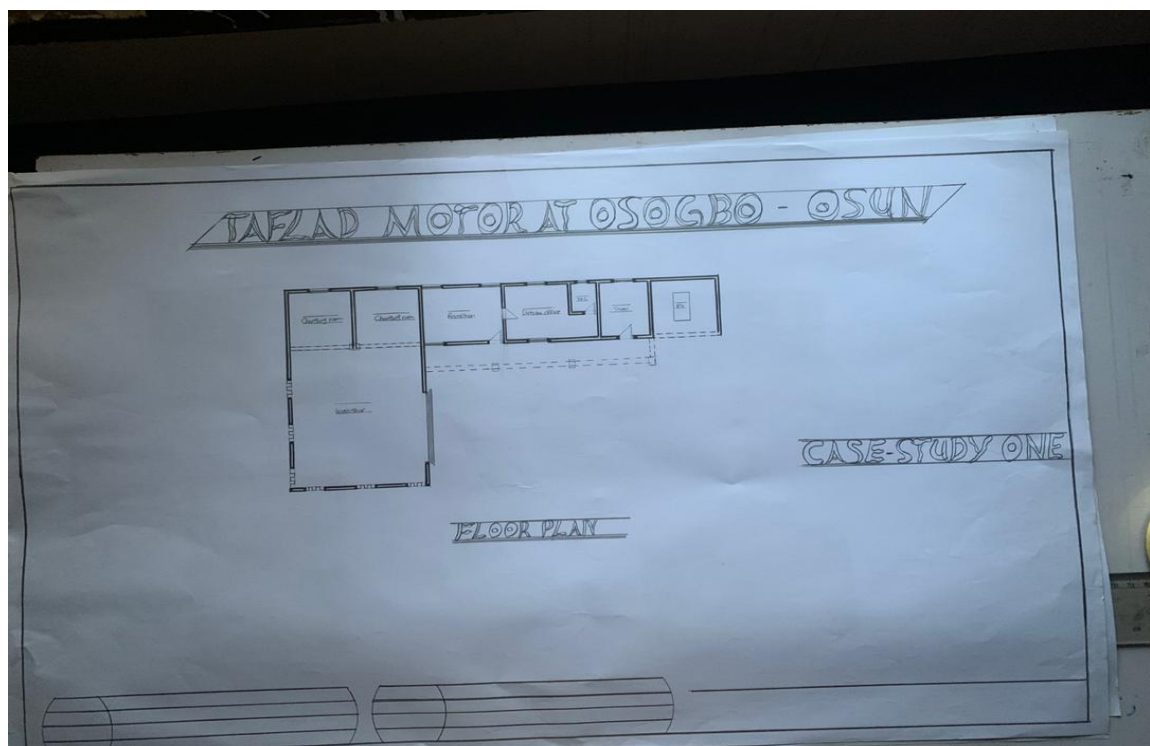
SHOWING THE GROUND FLOOR PLAN OF CASE STUDY ONE
